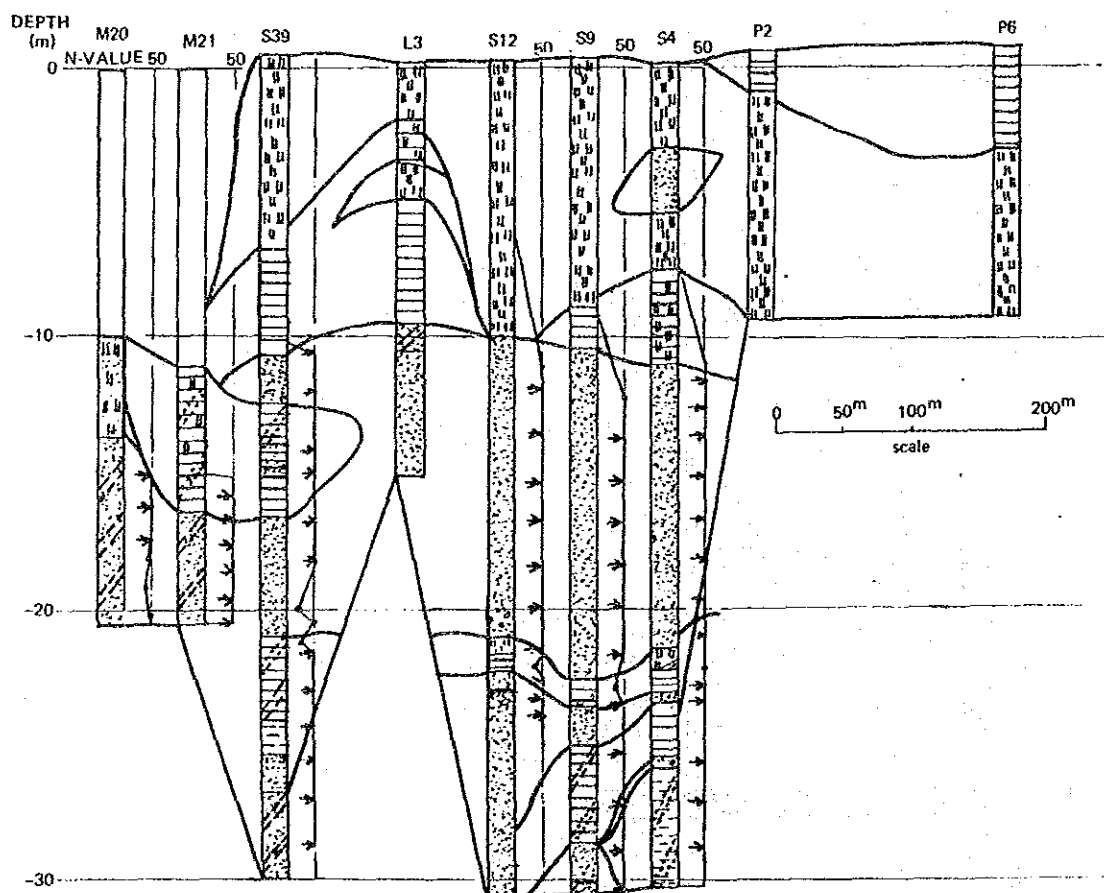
Soil Profile, Section ⑥ - ⑥
